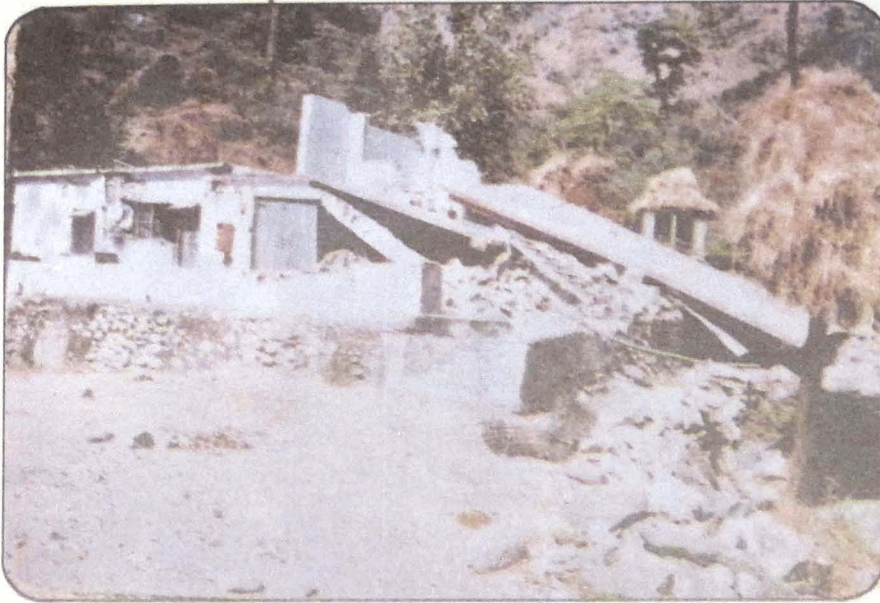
Collapse of wall and slided RCC slab, Bhatwari village.
